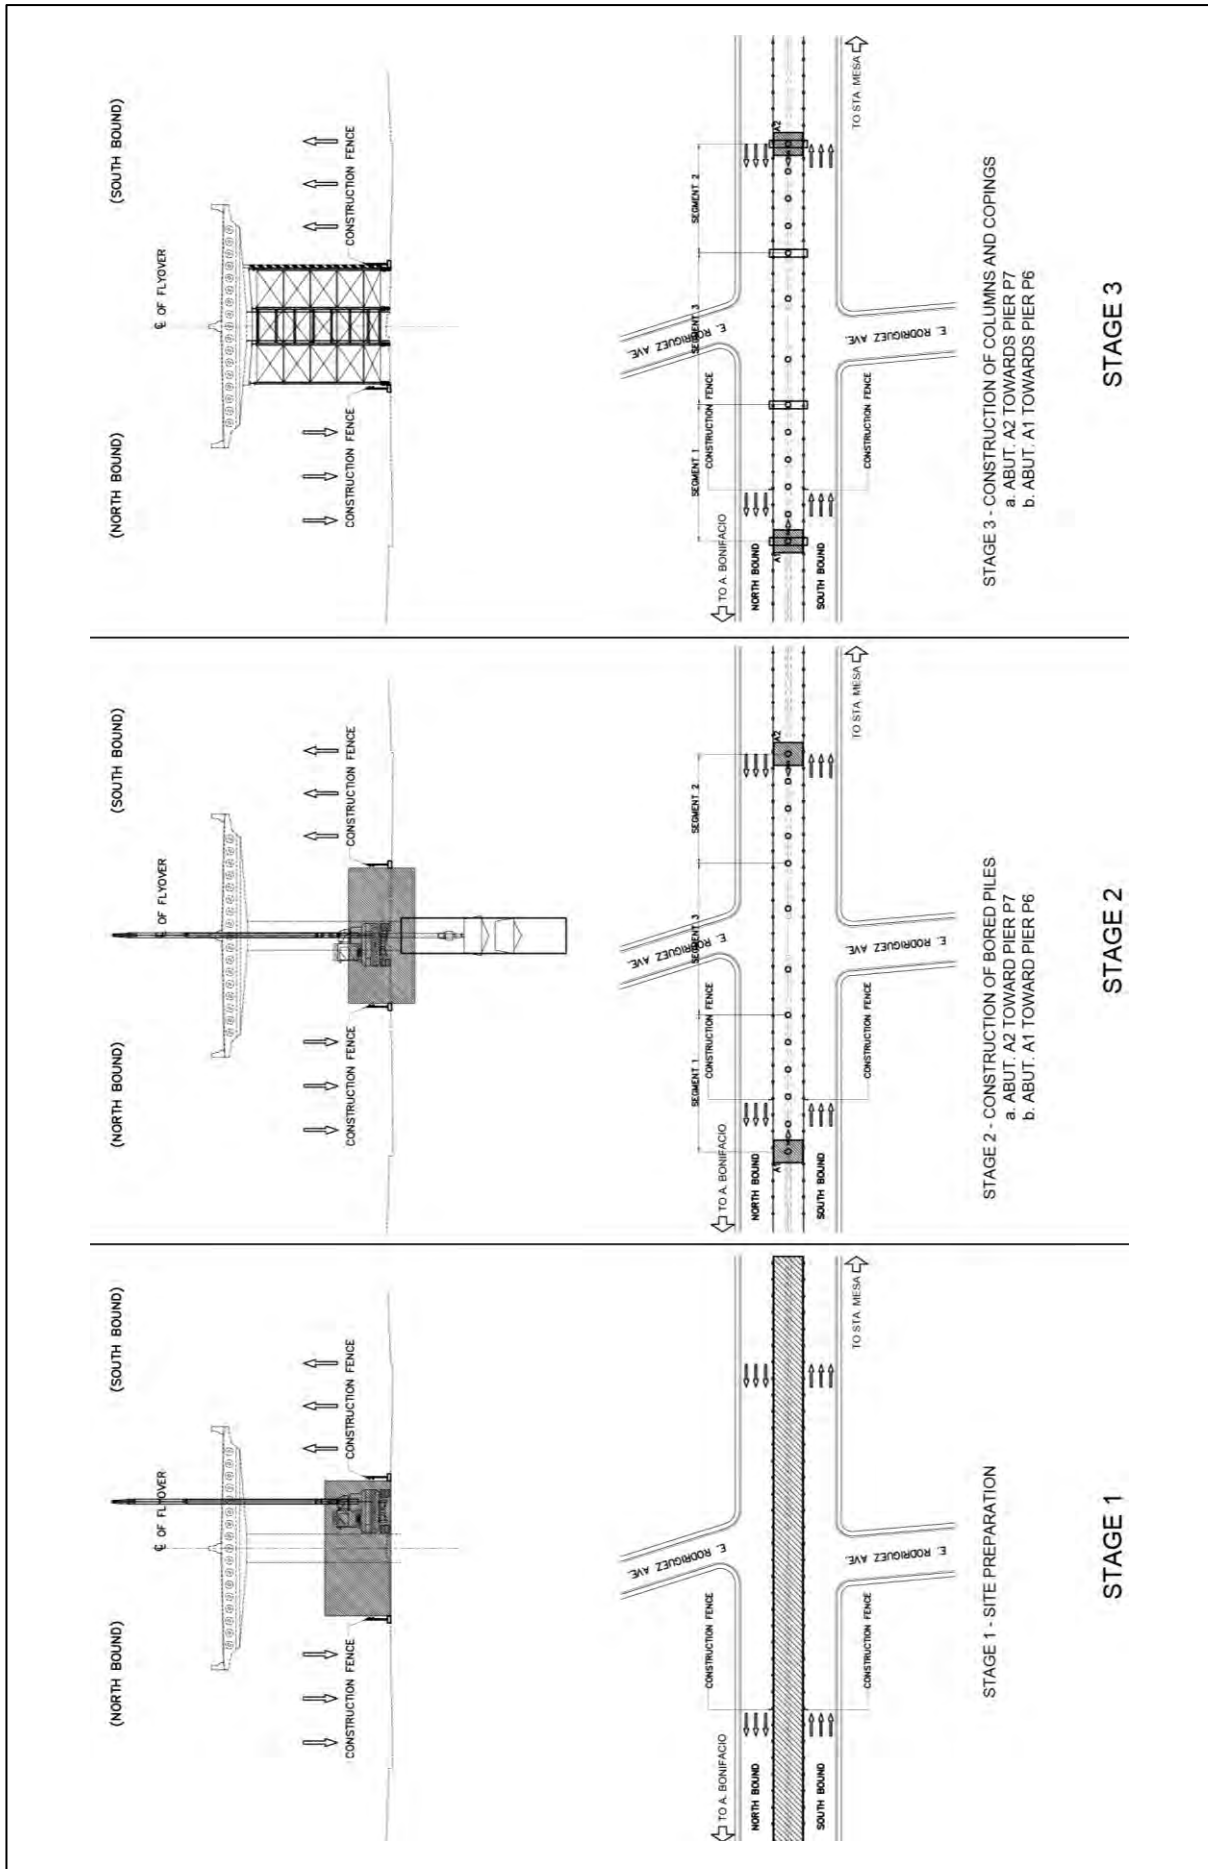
Construction Plan for C-3/E. Rodriguez Interchange (1/2)
